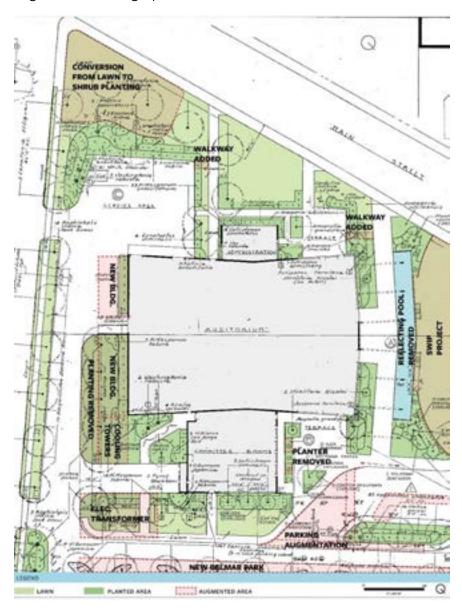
Annotated original site plan documenting changes to Shellhorn's design.
